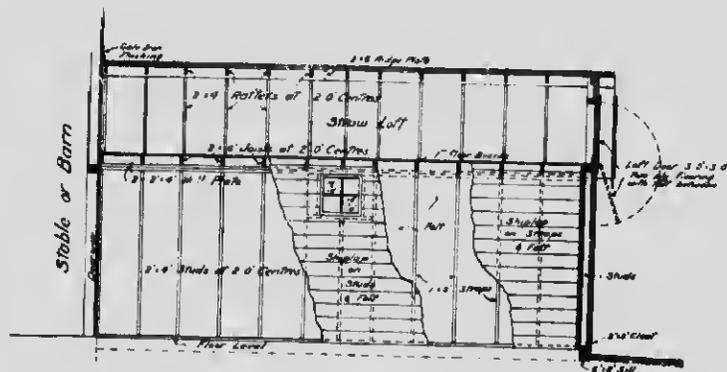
LONGITUDINAL SECTION OF ABOVE-GROUND ROOT-HOUSE.
